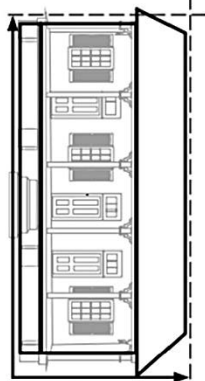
of the Historic Design Guidelines - Size and Shape of New Construction
